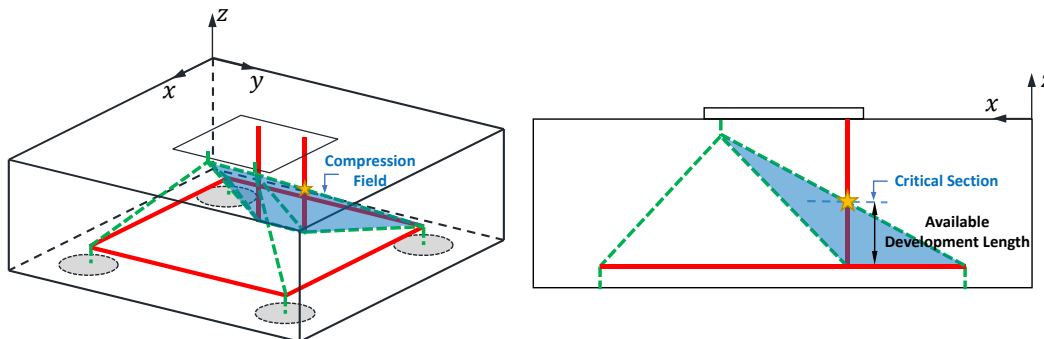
Compression field formed by diagonal struts and proposed critical section of column reinforcement
